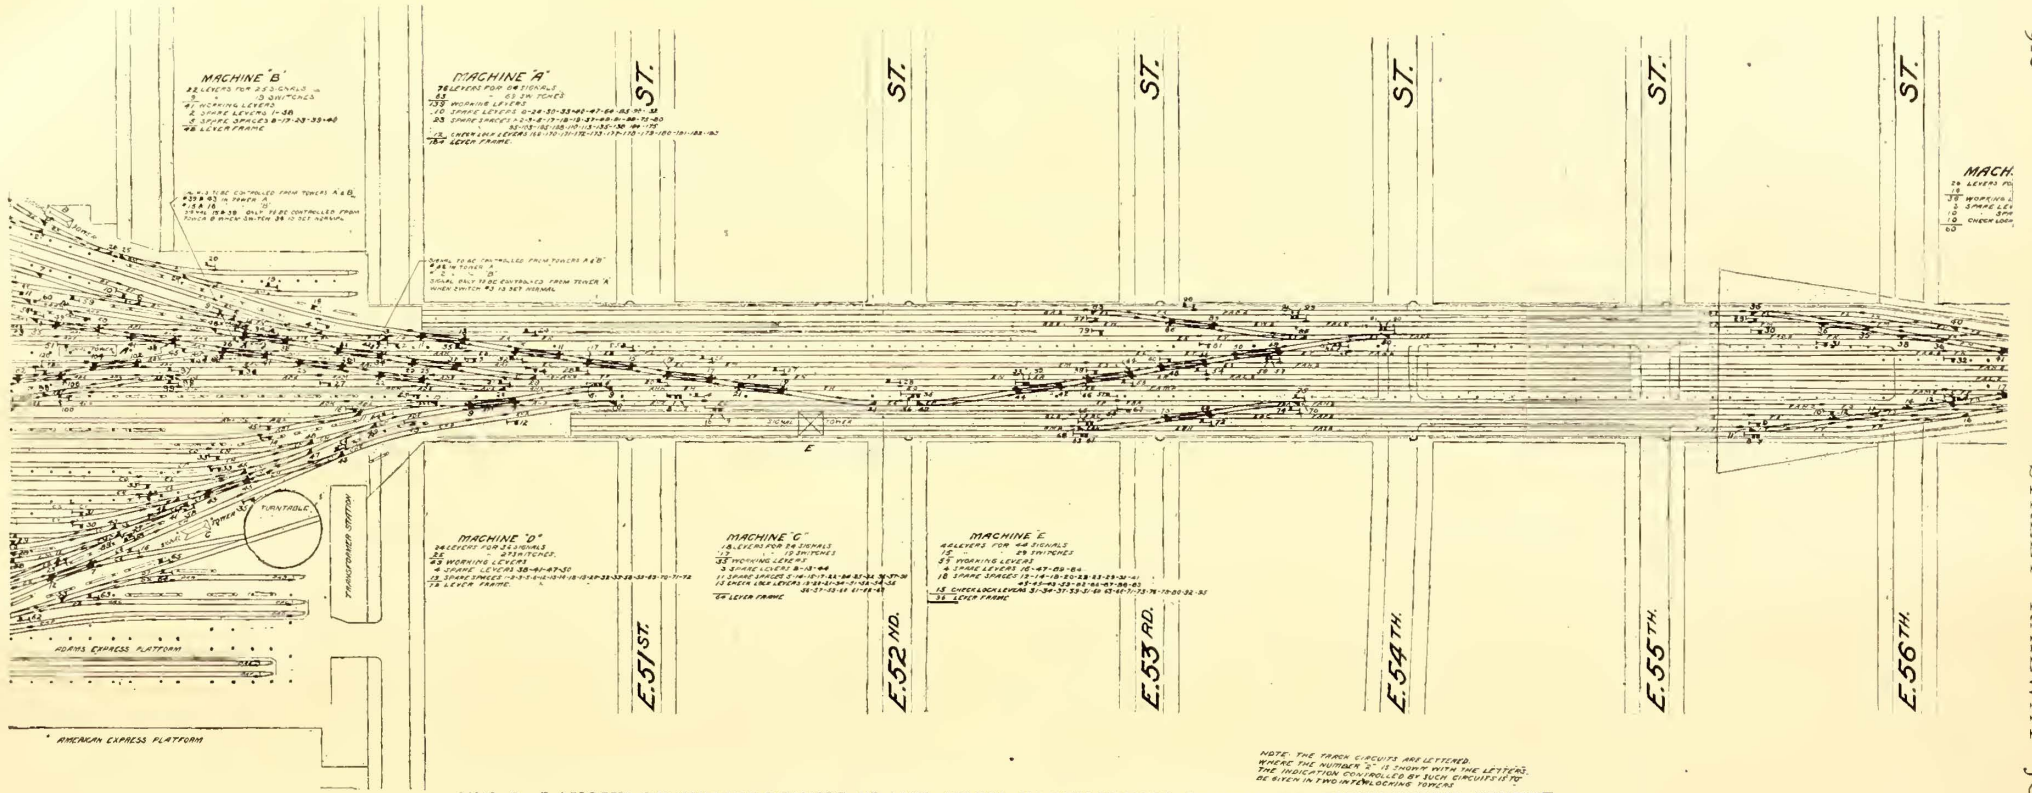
LAYOUT OF INTERLOCKING PLANT, FROM FORTY-NINTH STREET TO FIFTY-SIXTH STREET
